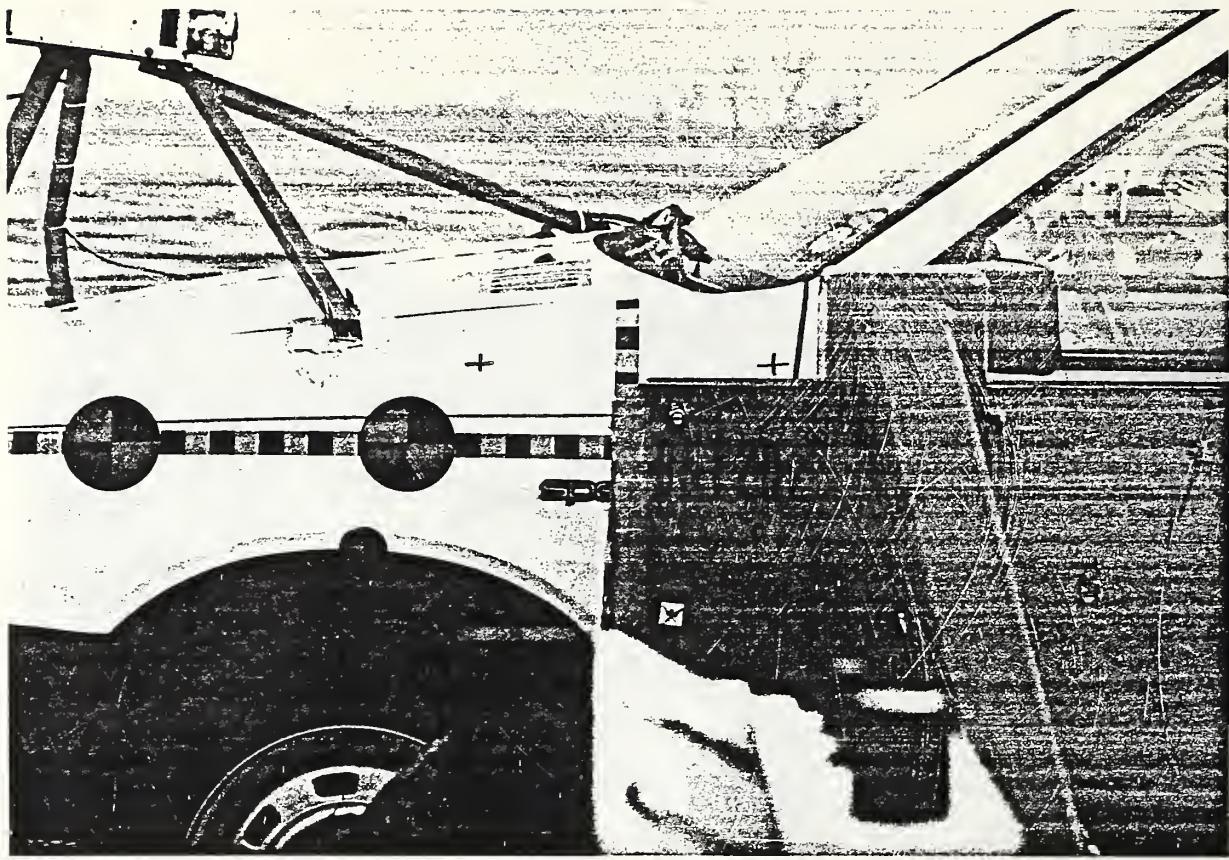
PRE-TEST CLOSEUP - VIEW 1
